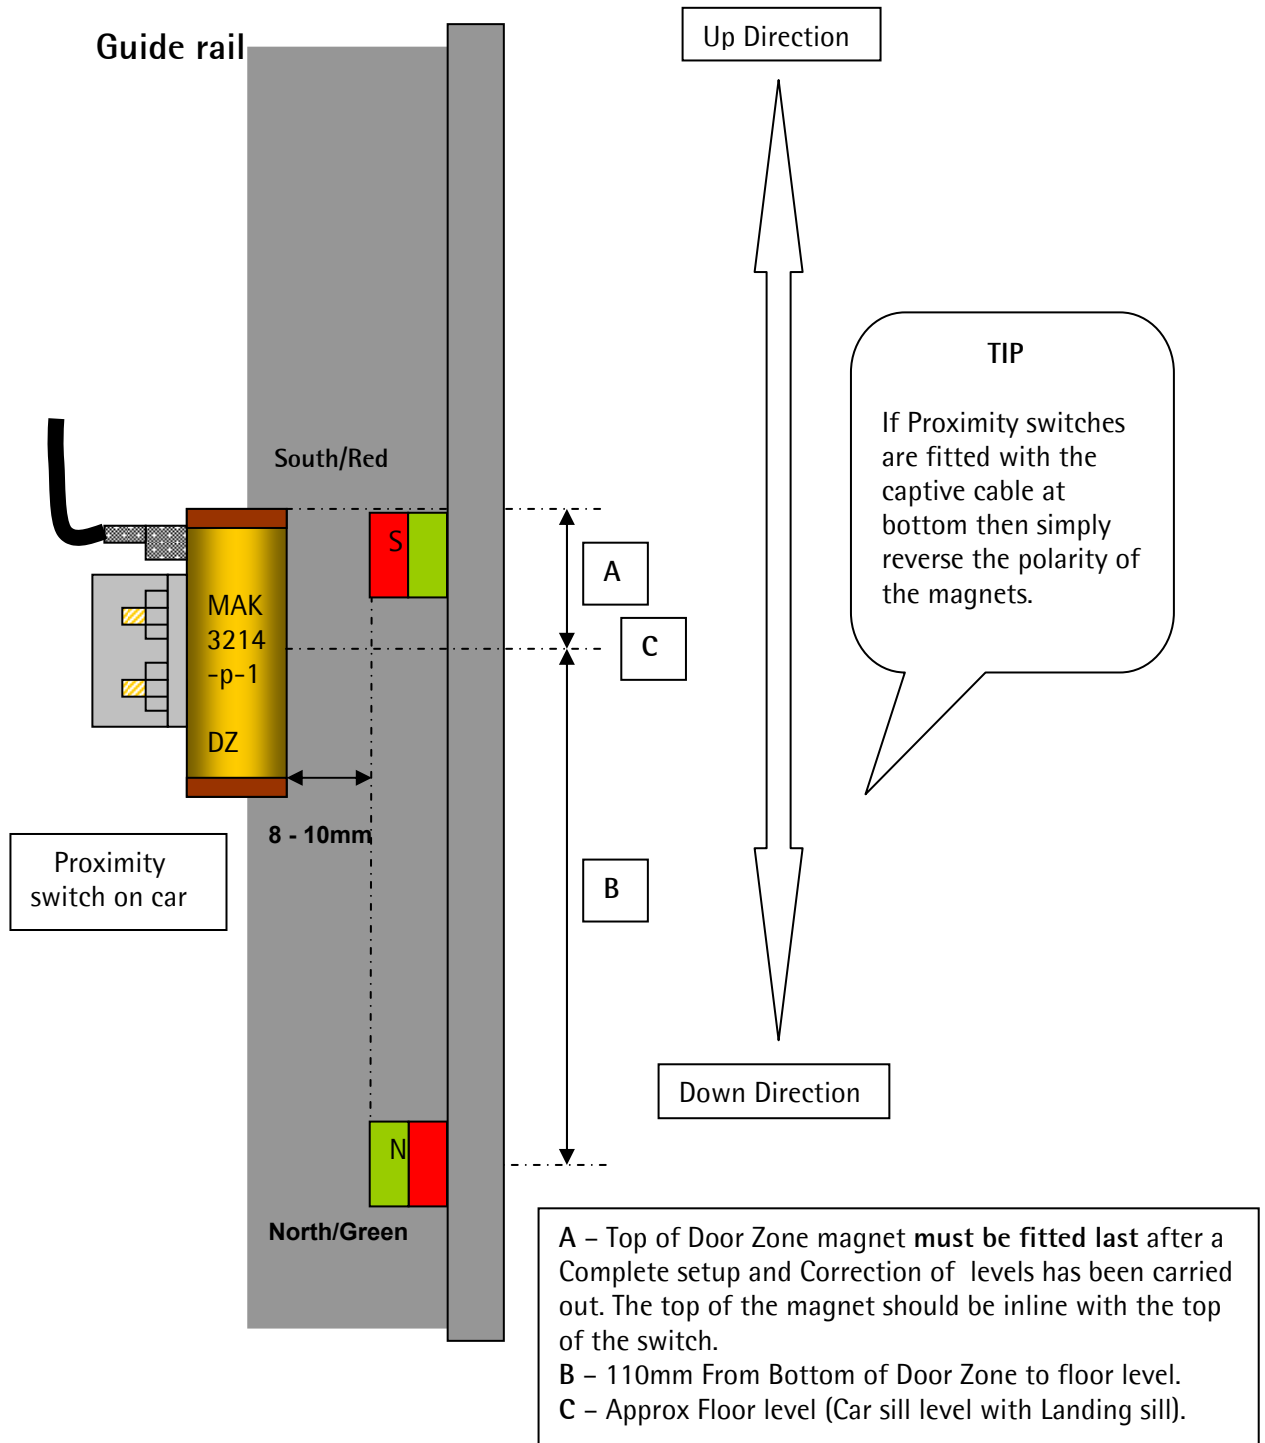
Door Zone for BOTTOM Terminal Floor
